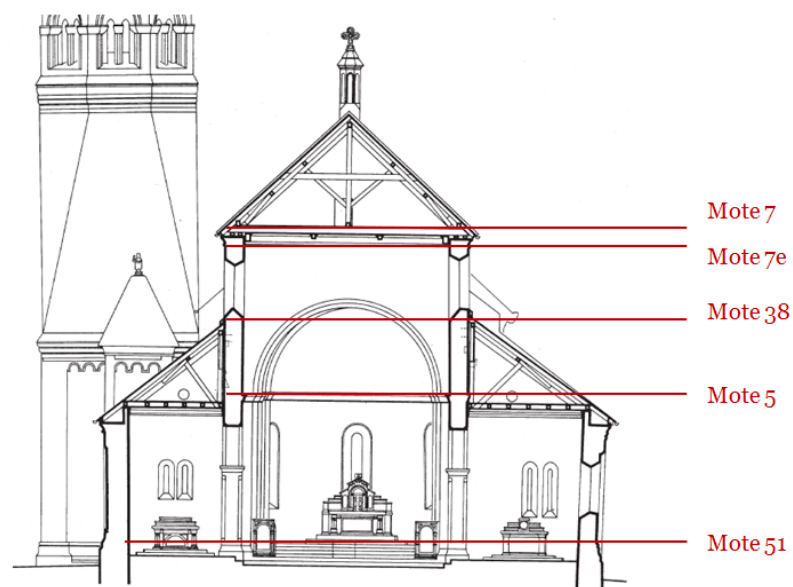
Mote elevation on the Johanniskirche cross-section
